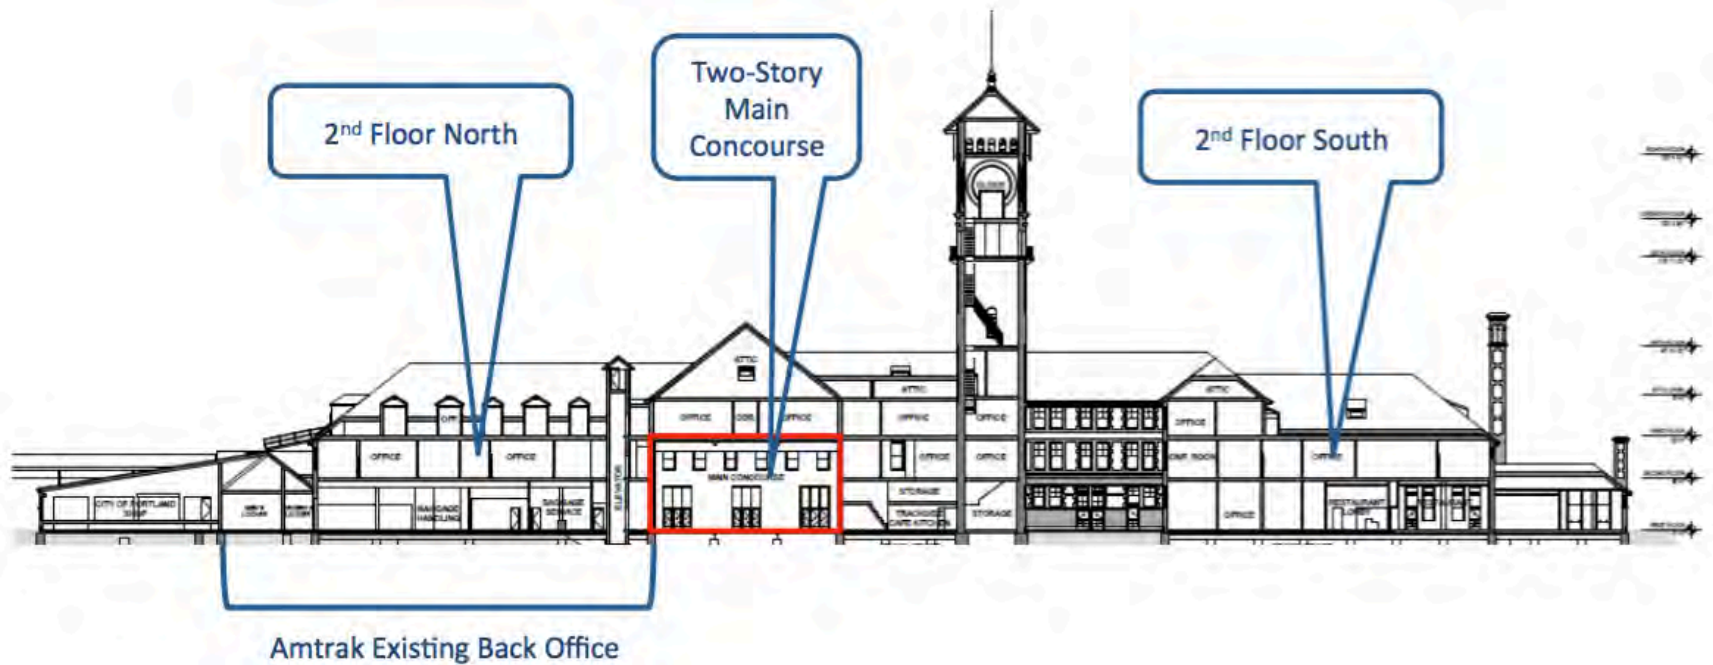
Elevation Illustrating Discontinuous Second Floor, Resulting in Lack of Elevator Access to Second Floor South
